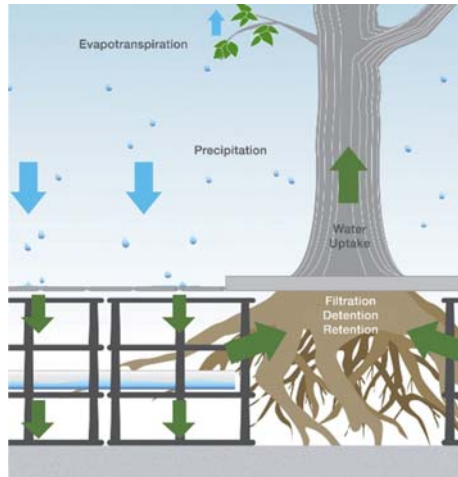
Schematic of modular suspended pavement system. Image: deeproot Inc.
